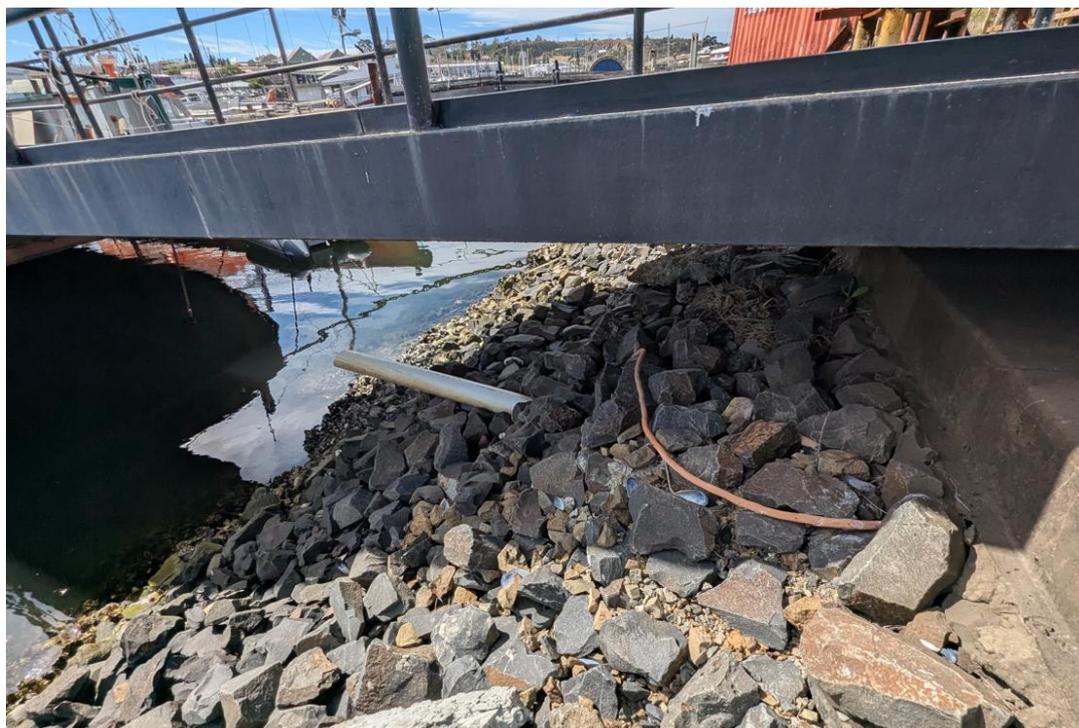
Existing stormwater outfall to Prince of Wales Bay
